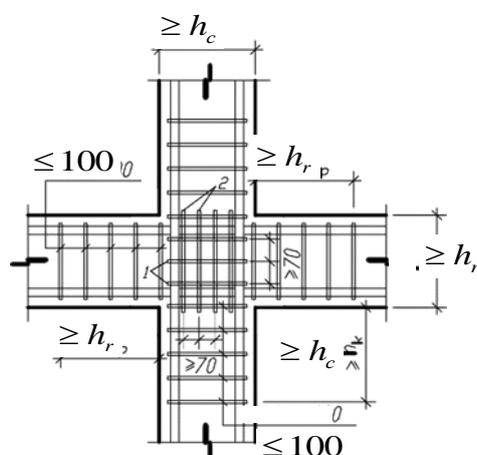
Transversal reinforcement of the central part of a beam-column joint and parts of beams and column adjacent to the joint: 1 — additional stirrups; 2 — additional vertical bars around the perimeter of stirrups.
